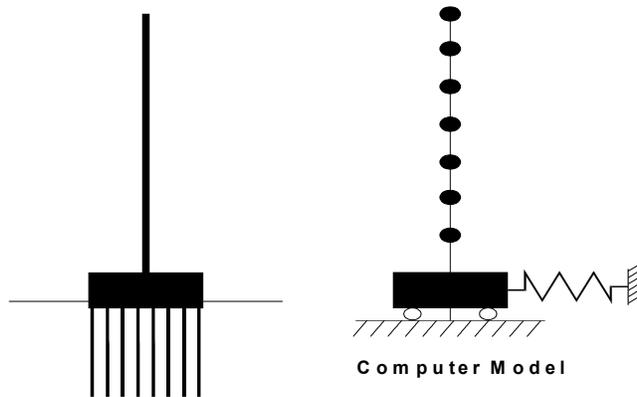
Cantilever Structure on Massive Stiff Foundation
